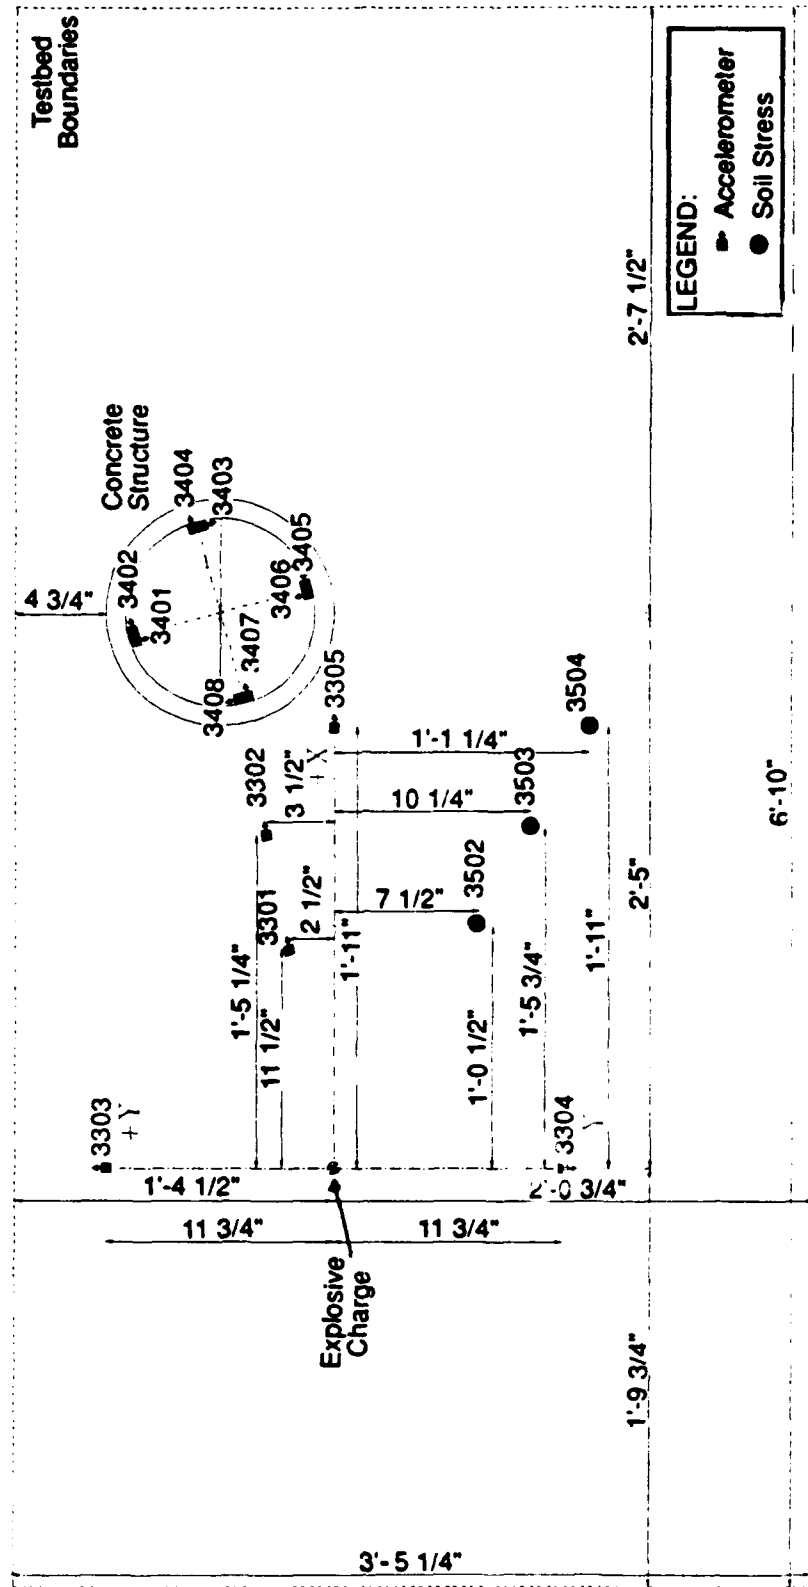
1/10th Replica-Scale Testbed (Elevation View).
